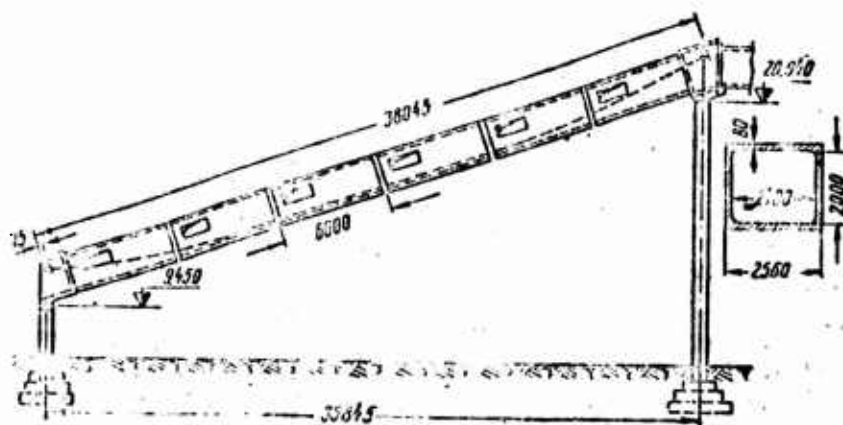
A conveyor gallery with a span of 35.8 m using stressed-reinforced span structure, assembled from channeled ferroconcrete sections.
